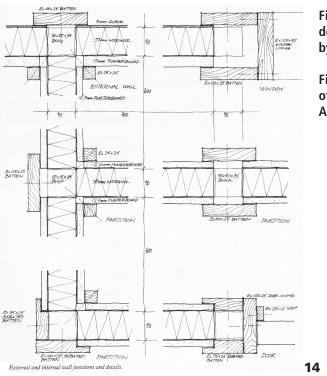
Typical wall detail. (Drawing by Jon Broome).
